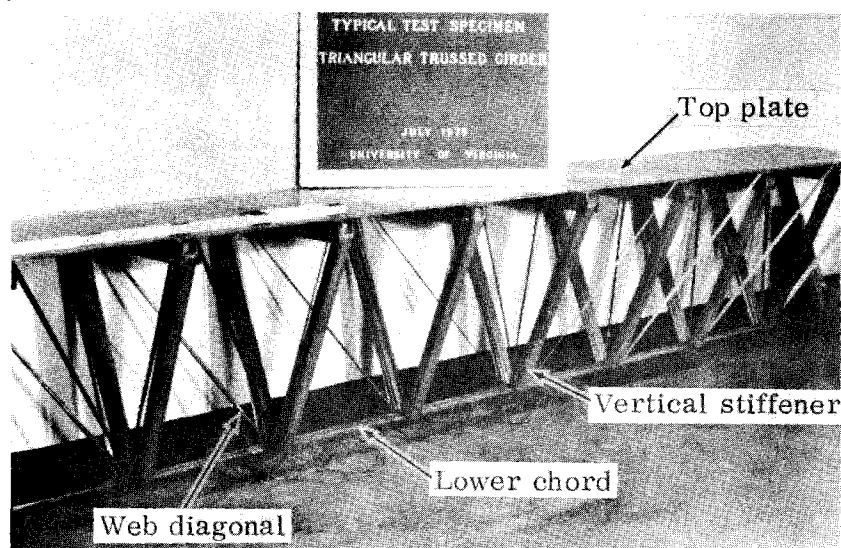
Typical test specimen of a single unit, triangular trussed girder.
